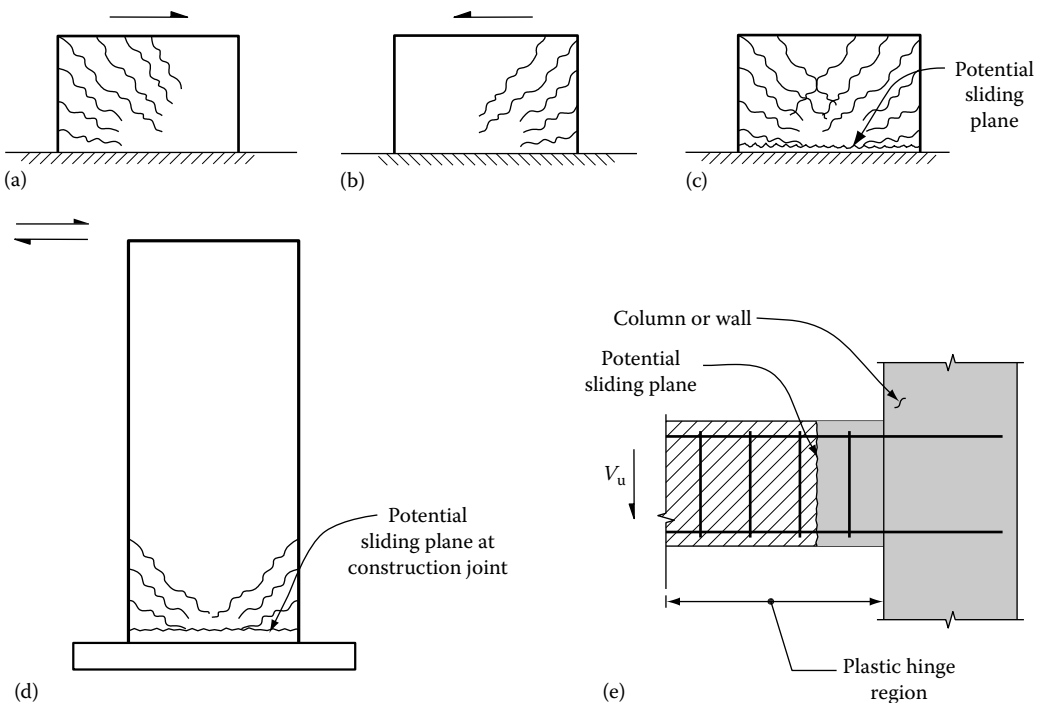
Potential locations of sliding shear. (a–c) Squat wall, (d) tall wall, and (e) plastic hinge region in a frame beam.
